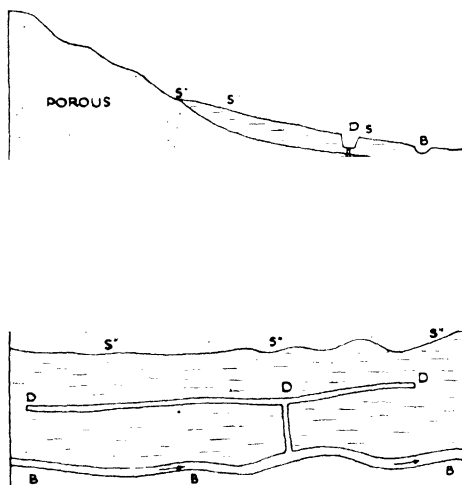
SECTION AND PLAN OF A HILLSIDE SHOWING METHOD OF DRAINING SPRINGS.
